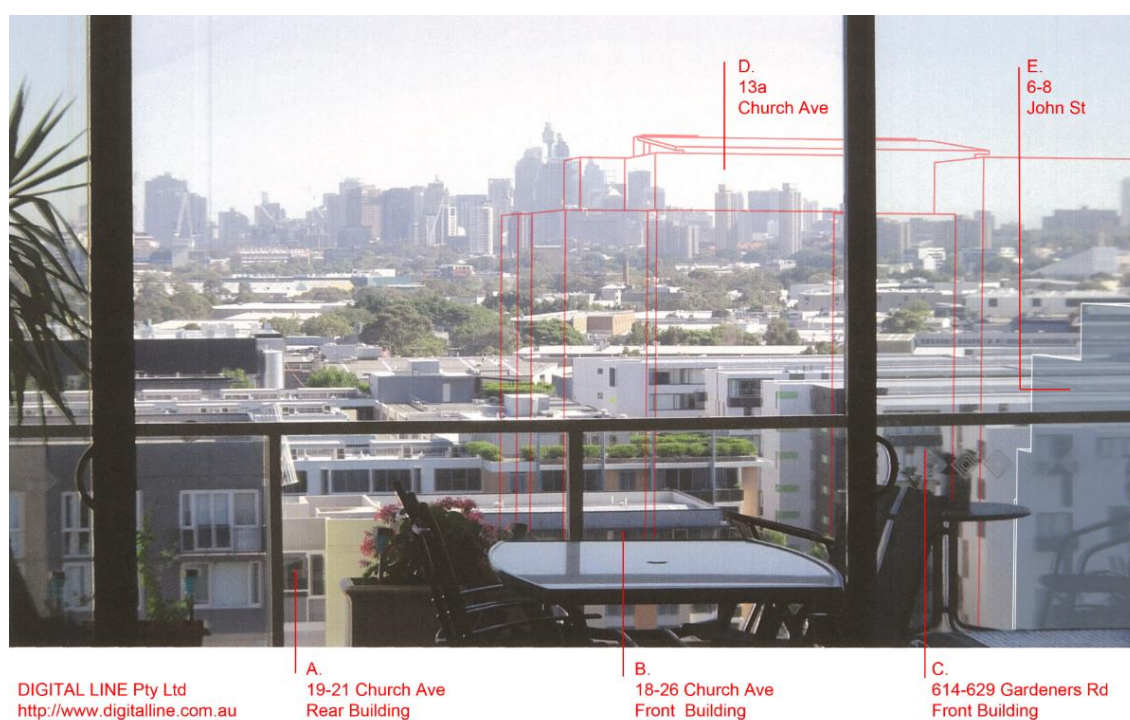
Photomontage provided by applicant of the proposed developments at 6-8 John Street and 13A Church Avenue
